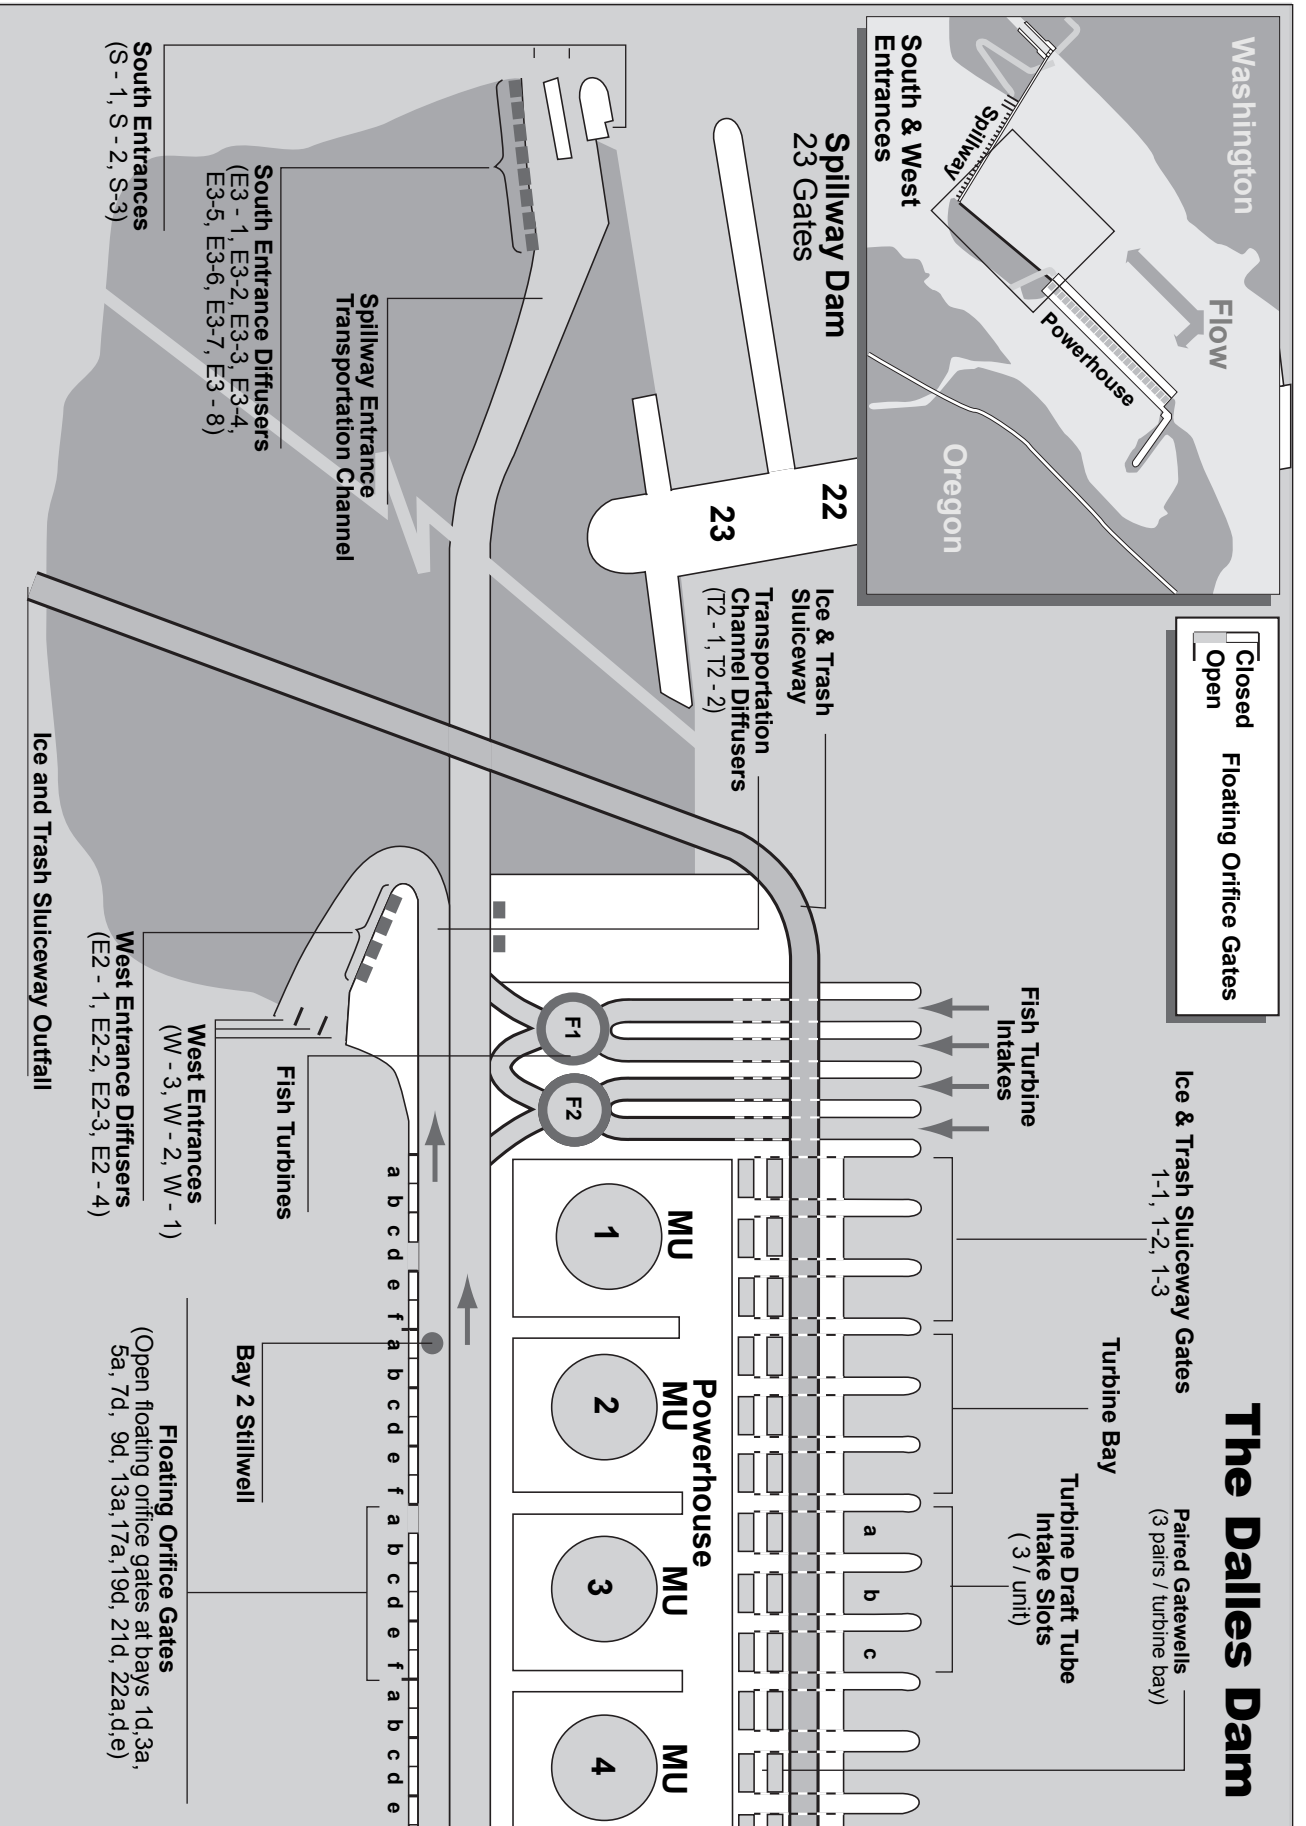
The Dalles Dam South and West Fish Ladder Entrances
